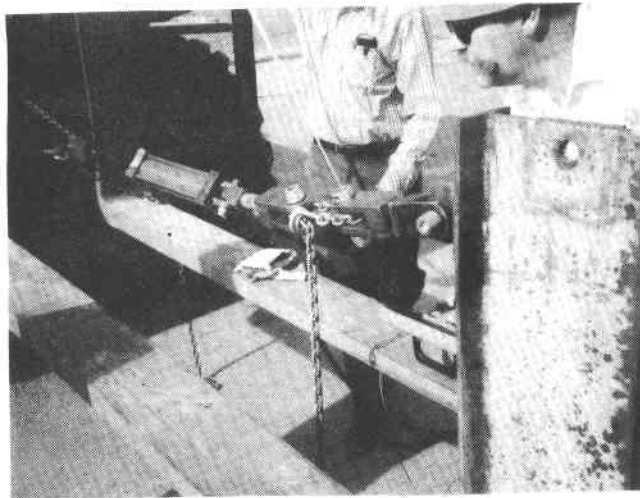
Preparing to Apply Horizontal Load to Heavy Duty Test Frame
